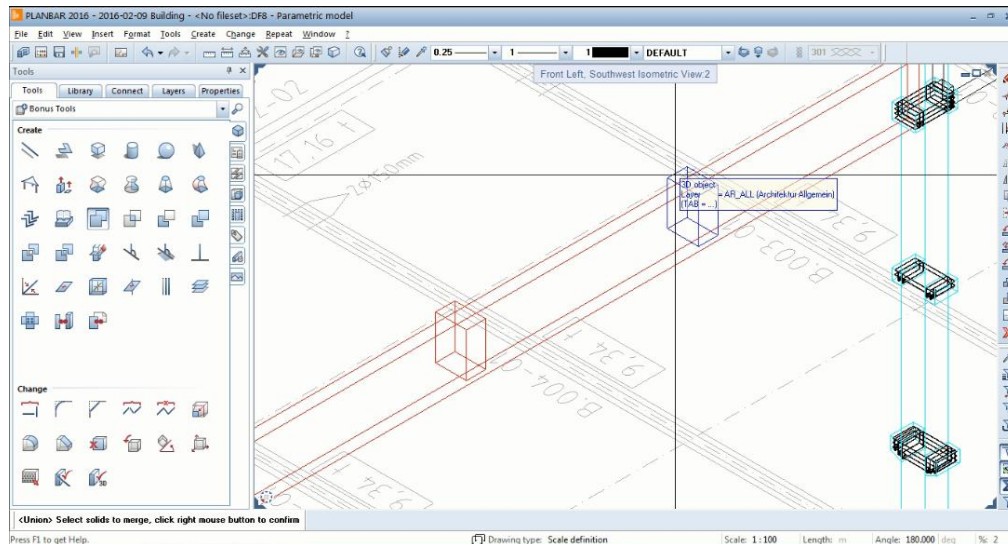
Implemented model. Detailing of girder. Union of 3D objects
